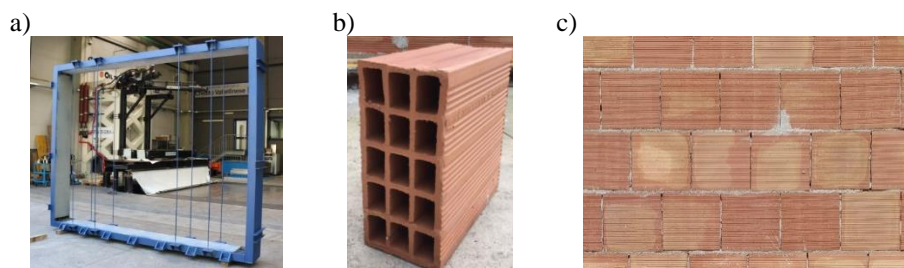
a) Steel concrete composite bare frame; b) Horizontally perforated units; c) poorly done head joints
